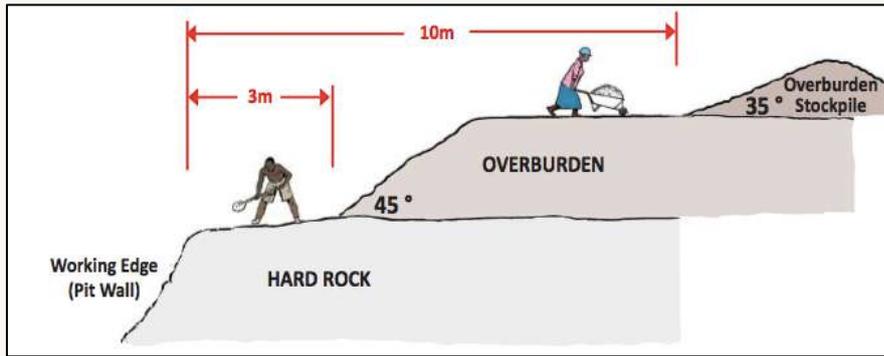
Place waste rock and overburden at least 10metres from the edge of your pit
